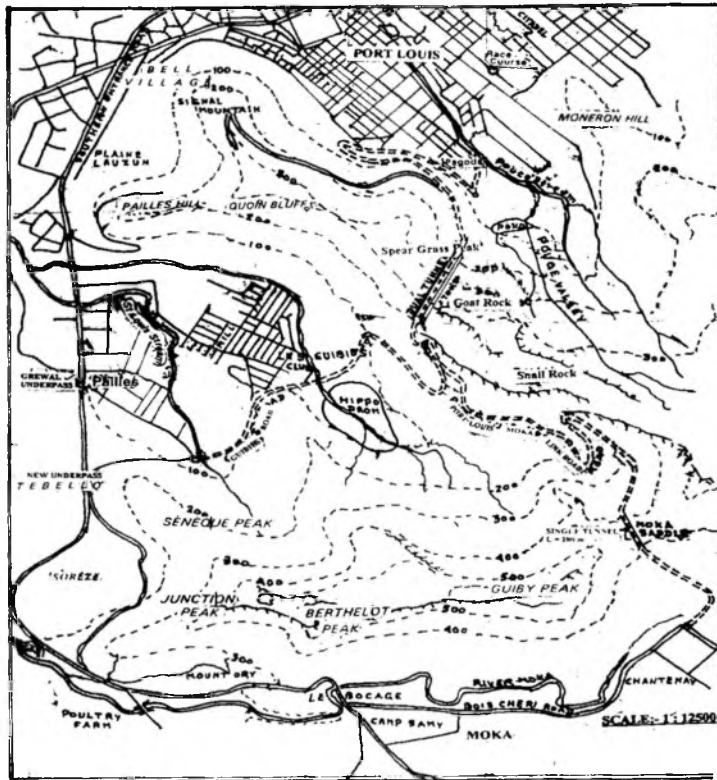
PLAN SHOWING NEWLY PROPOSED PORT LOUIS-MOKA LINK ROAD A
